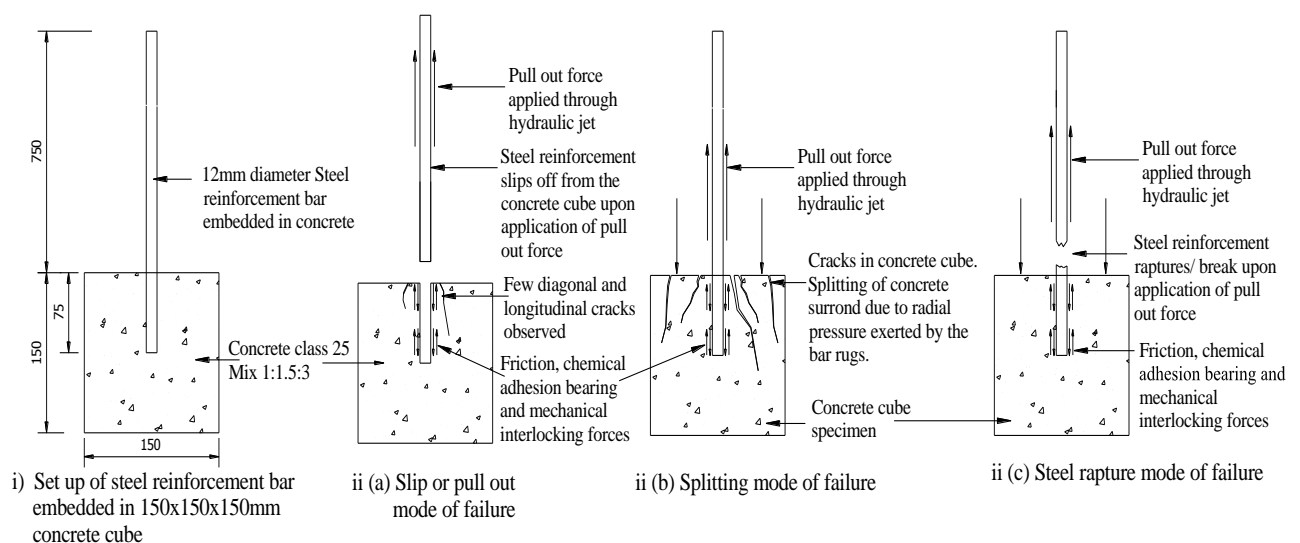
Modes of bond failure between concrete and steel reinforcement bar
